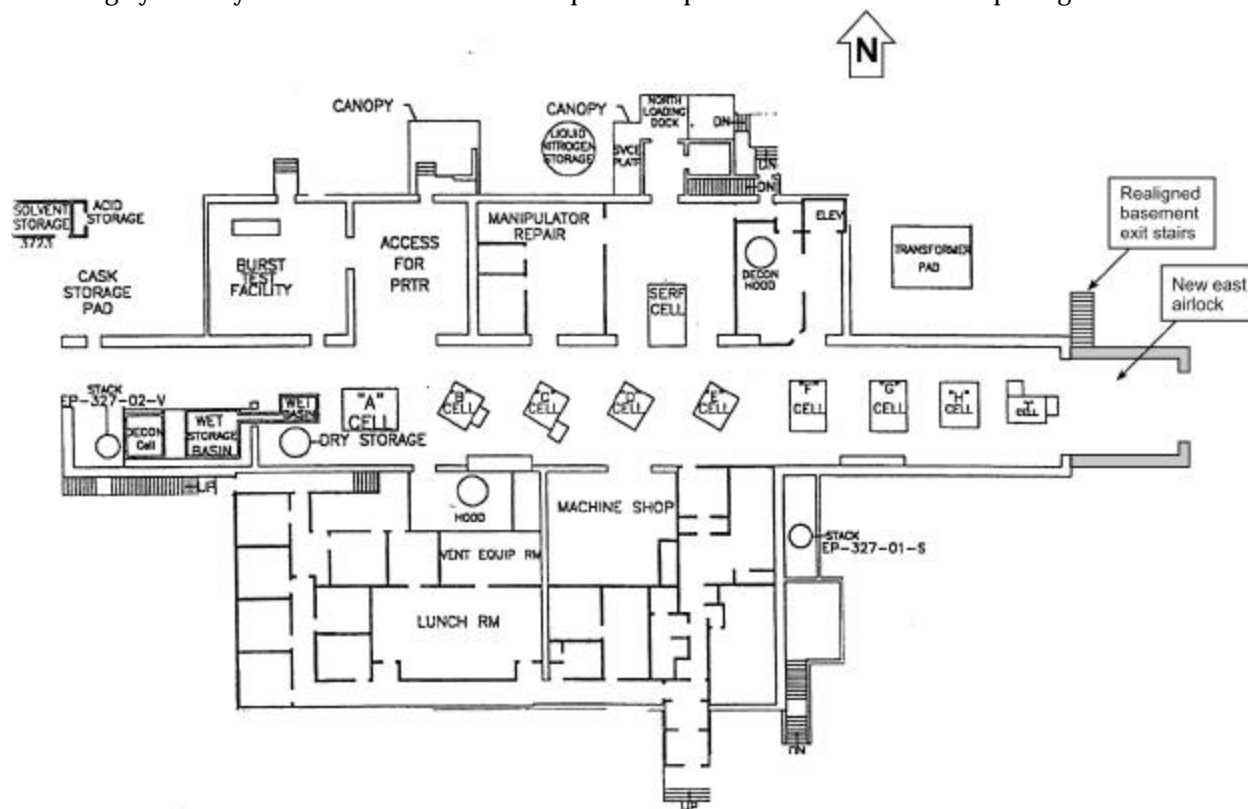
327 Building Floor Plan with New Temporary Airlock Building on the East End
